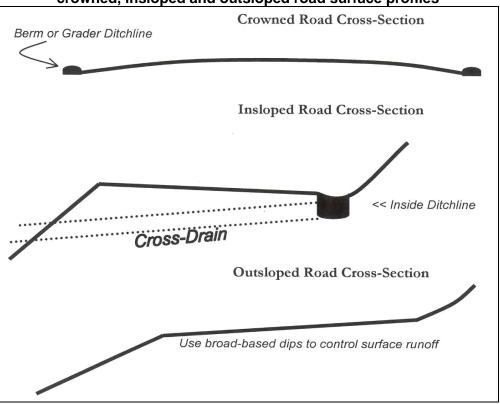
I: Schematic cross-sectional sketch of crowned, insloped and outsloped road surface profiles
